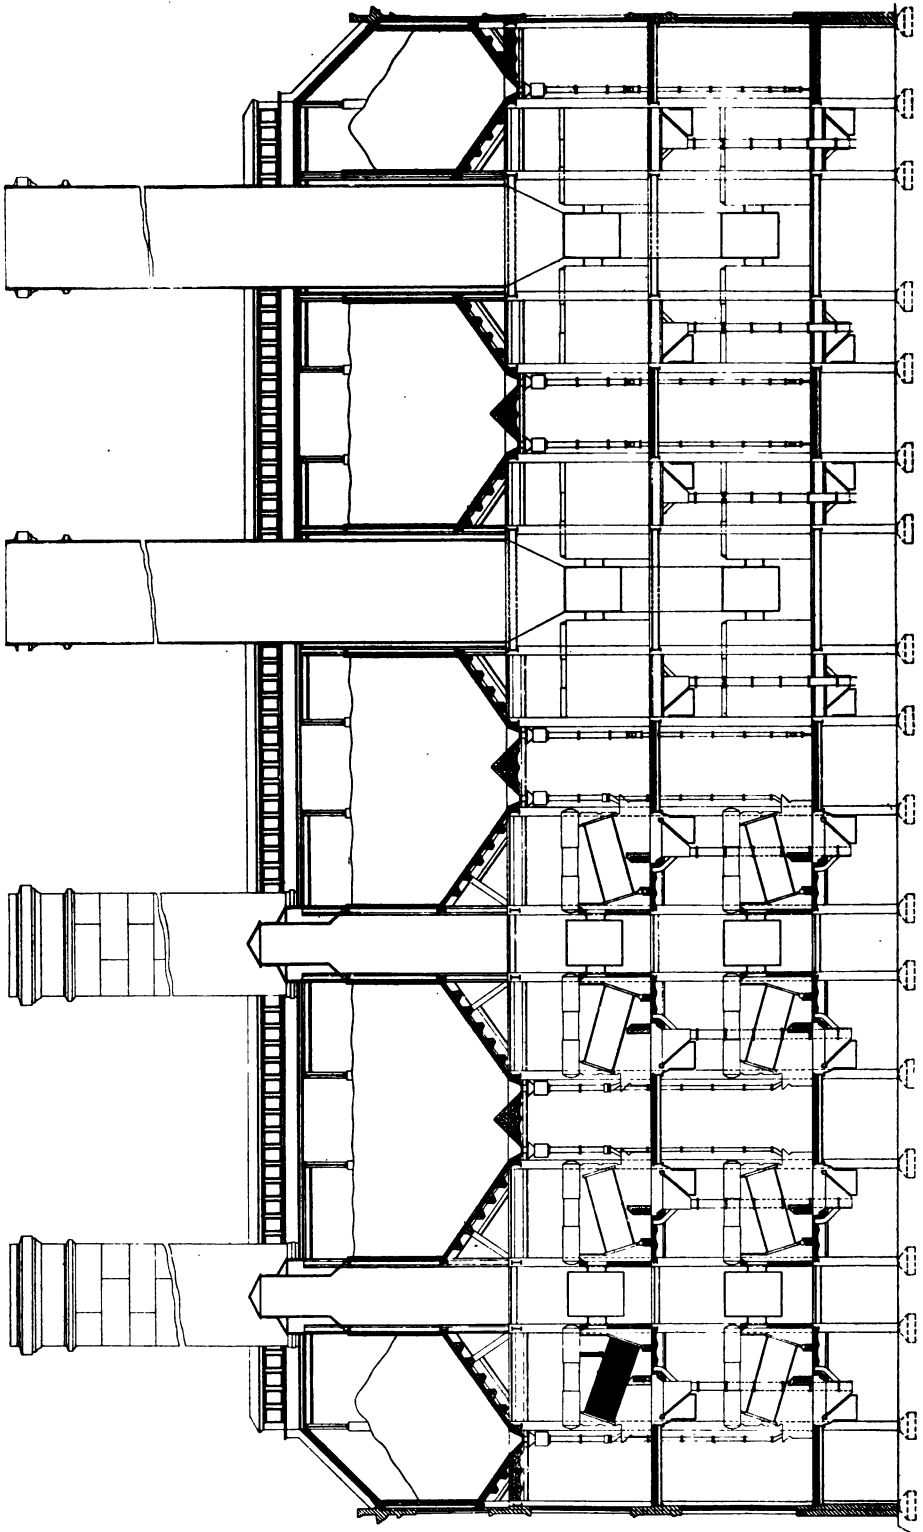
Longitudinal Section through Boiler Room, Waterside No. 2.
